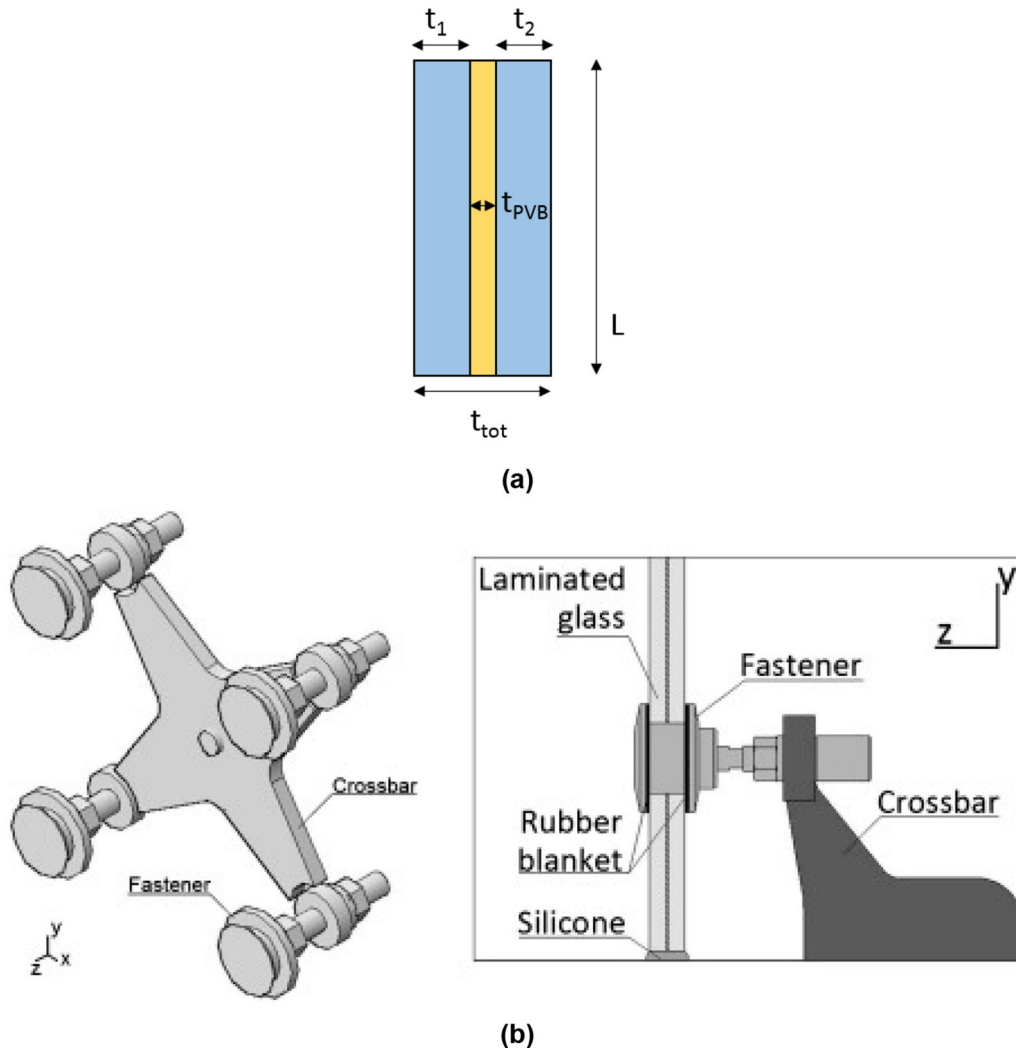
Schematic drawing of façade details: a laminated glass section, b point-fixing connection
